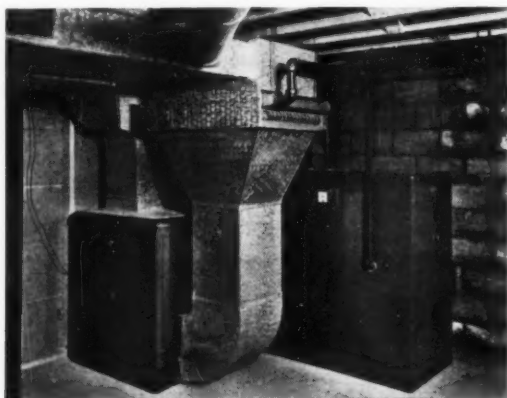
VIEW OF BOILER, BLOWER, AND HEAT EXCHANGER
